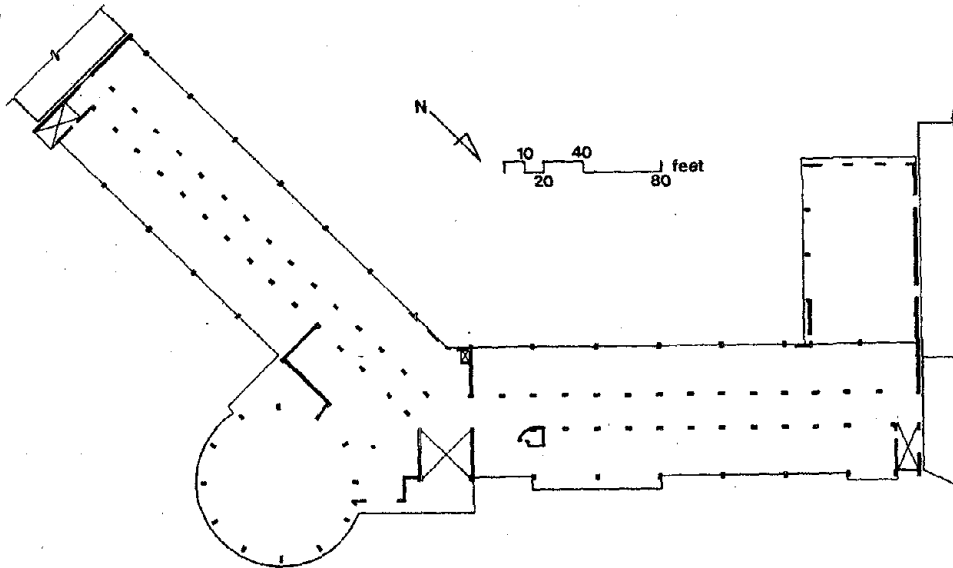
Plan of West Anchorage High School, Alaska, 1964
